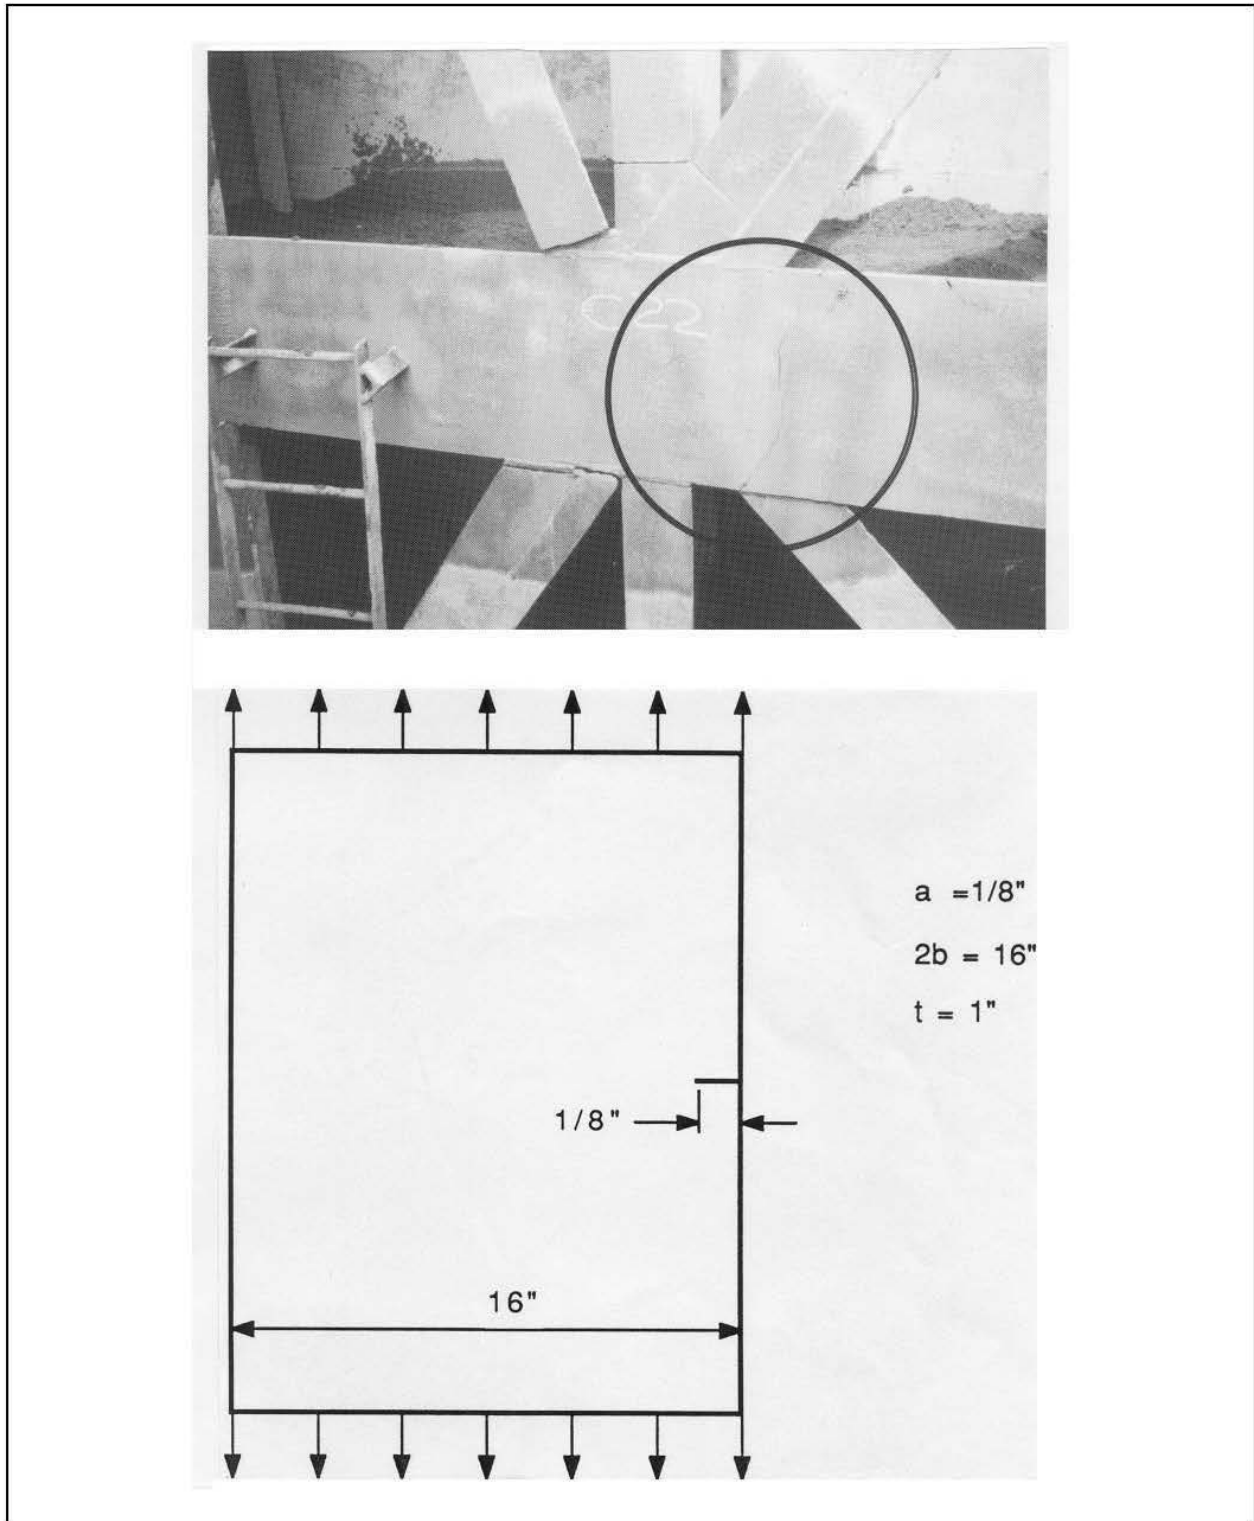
A single-edge cracked girder (1 in. = 2.54 cm)
